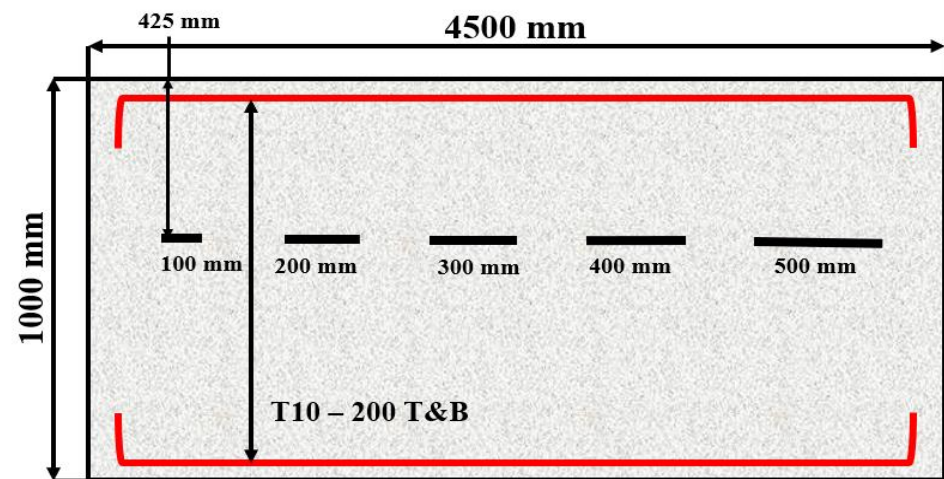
Plan View of the Placing of Polystyrene Boards in the Concrete Specimen.
